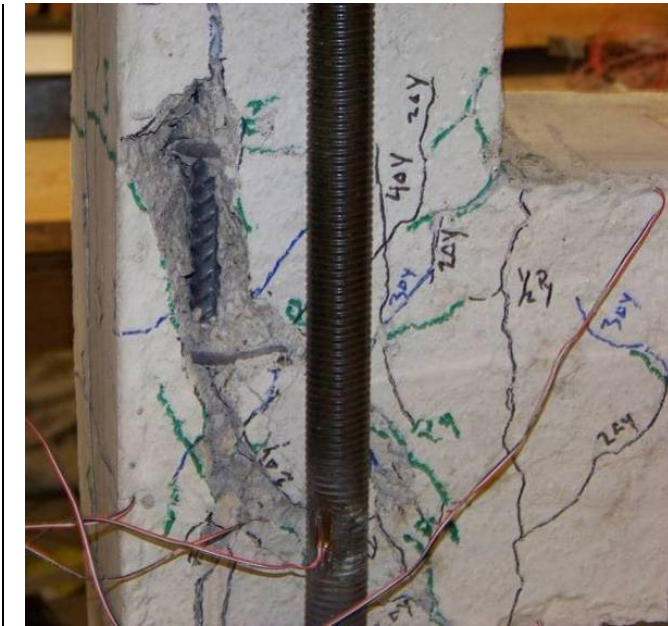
Specimen 1 joint damage at failure (Fisher 2009)
